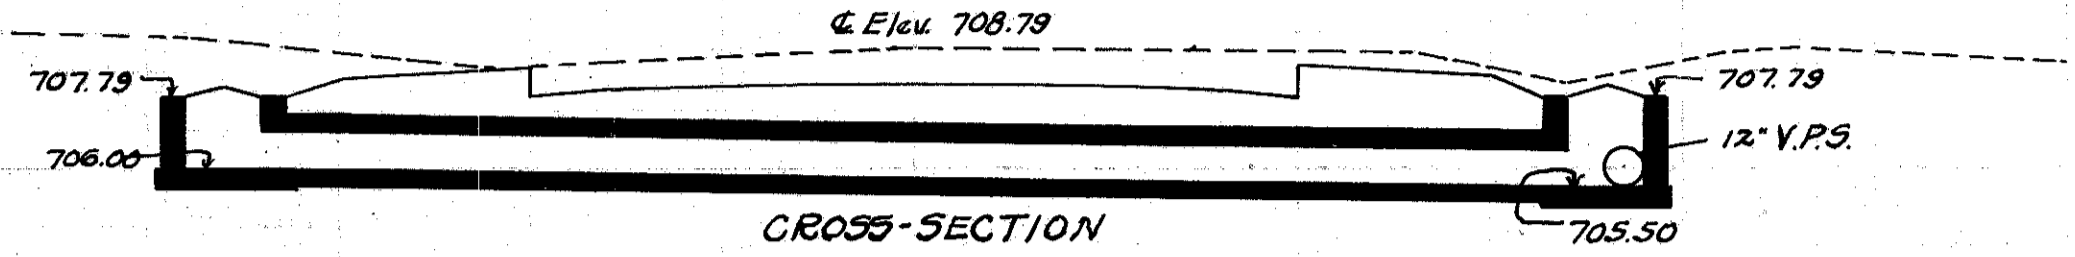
DETAIL OF PLAIN CONCRETE WALL 30' TO R OF C FROM STA. 488+50 TO STA 490+0
